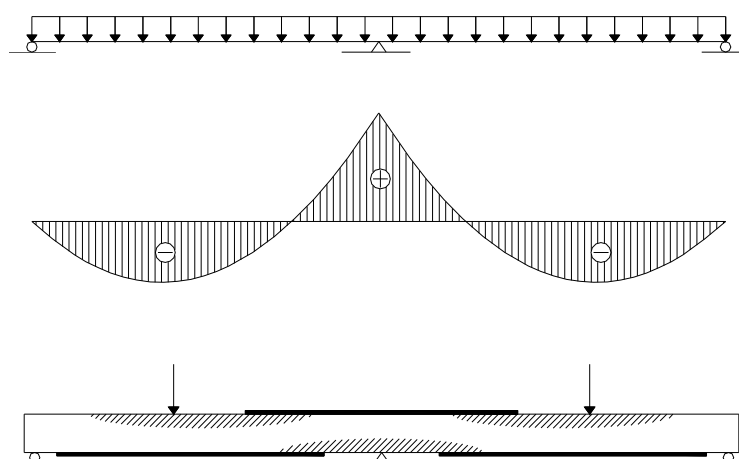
Moments with opposite signs in continuous beams and anchoring laminates into compression zones
